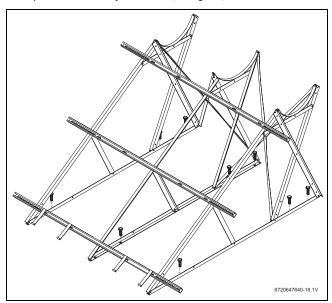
Roof connection for flat roof system on concrete slabs with additional supports
